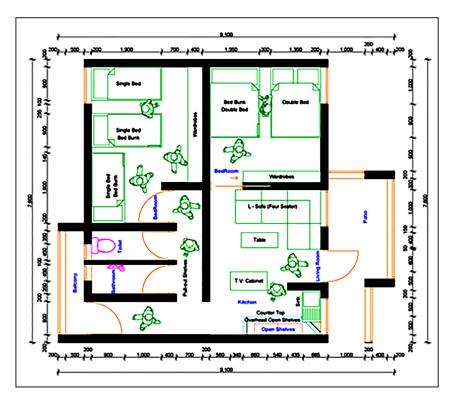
Two-bedroom house floor layout plan option plan two Source: Author's construct 2018
